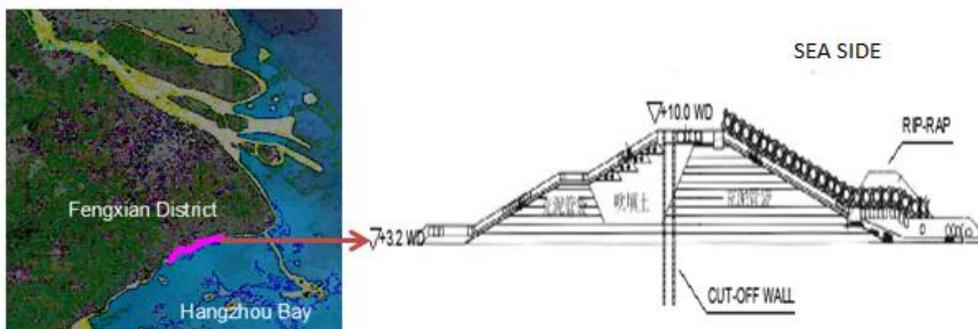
Typical Cross Section of Sea Dike in Fengxian District
